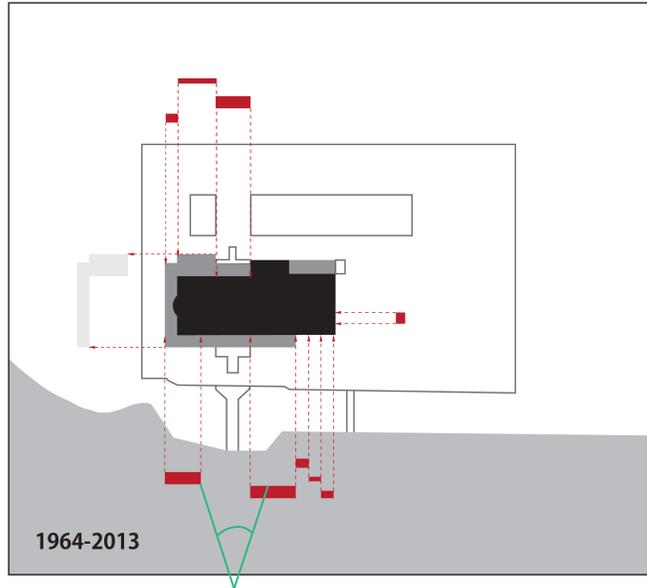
Indoor/Outdoor spaces 1964-2013; various portions of terrace enclosed and several new storage sheds added to exterior (Photo, Diagram: Author)
